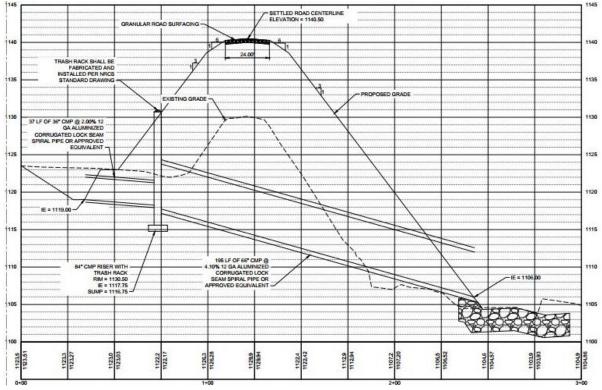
Proposed Dam Cross Section and Outlet Structure
